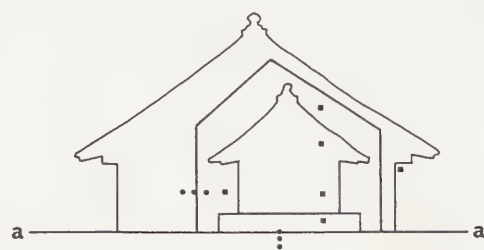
Konjikidō, a glass showcase, a shelter and sensors (sectional plan)
